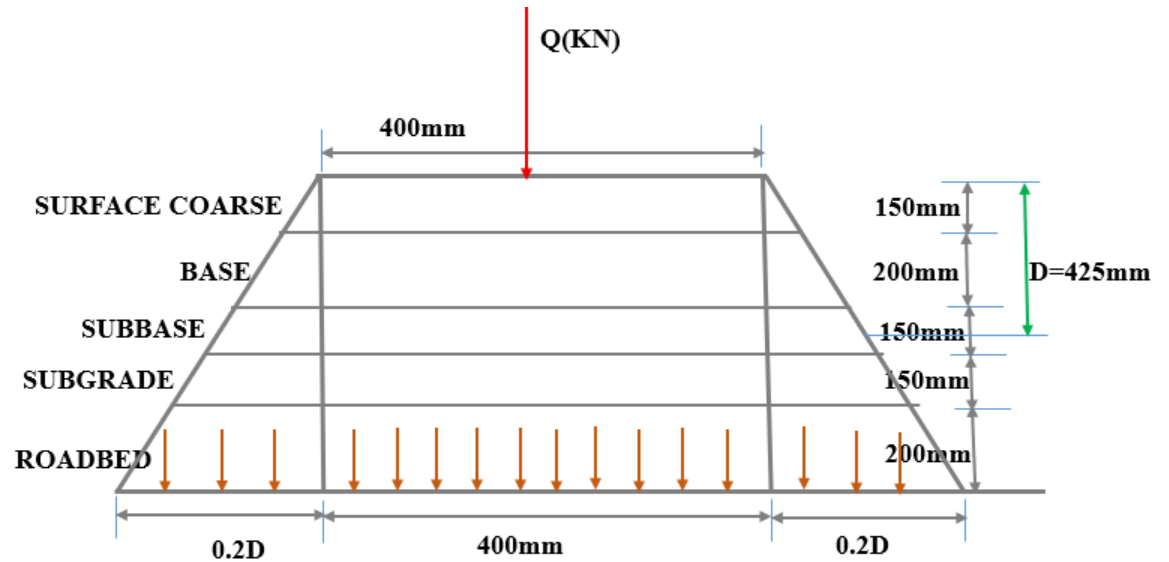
Wheel load distribution in the Road Pavement (*Adapted from Transport Research Laboratory, Overseas Road Note 4, 1993; UNRA, General Specifications for Road and Bridge Works, 2010*).
